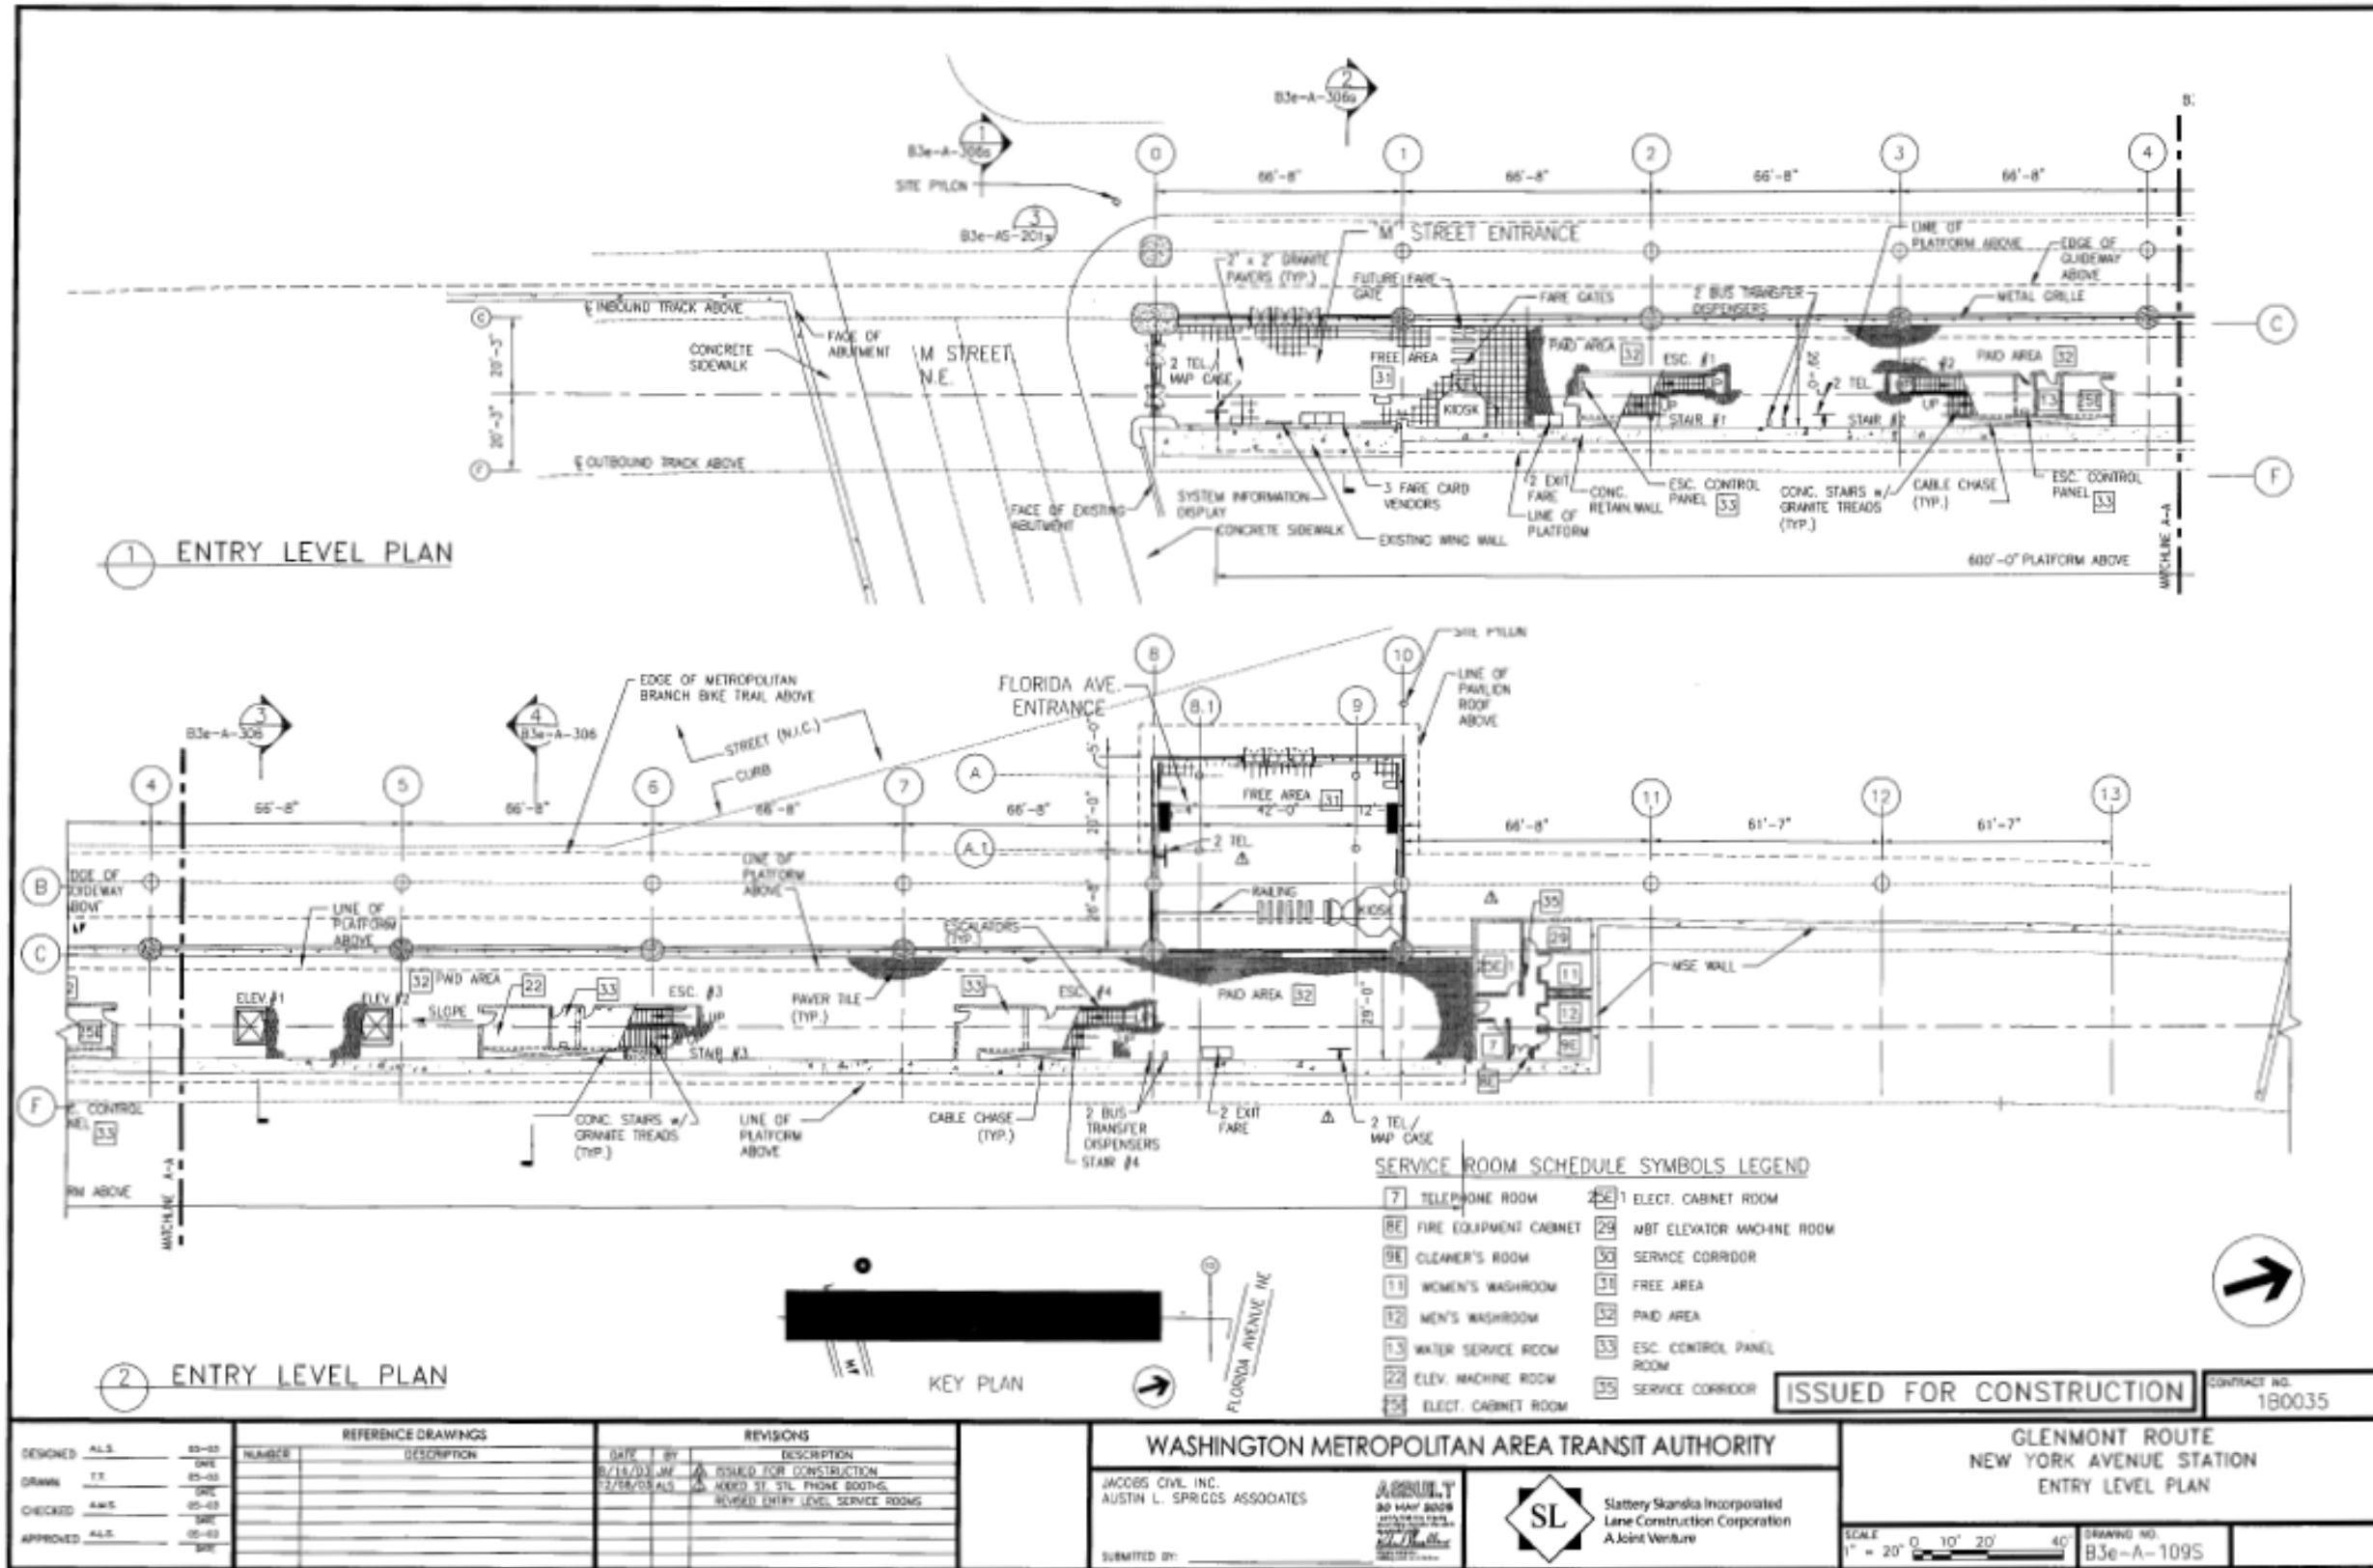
Partial Entry Level Plan (Florida Avenue Entrance), Drawing B3e-A-119s, New York Avenue Station As-built, 2005
